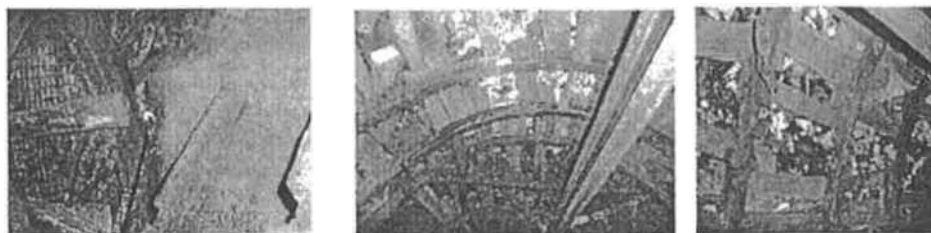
,6,7,8. A method of stabilizing, installation of packers, geotechnical anchors and suspensions of Basf/MEYCO
